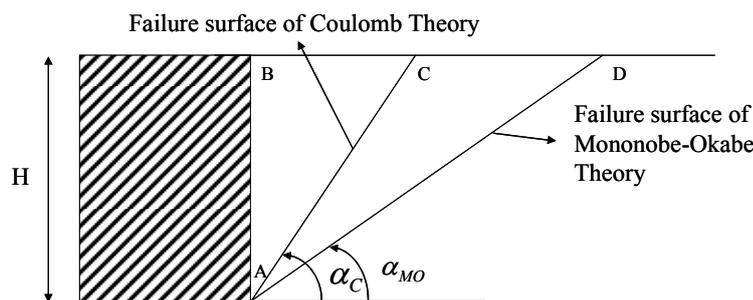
Failure surfaces in the backfill under both static and dynamic loading conditions
